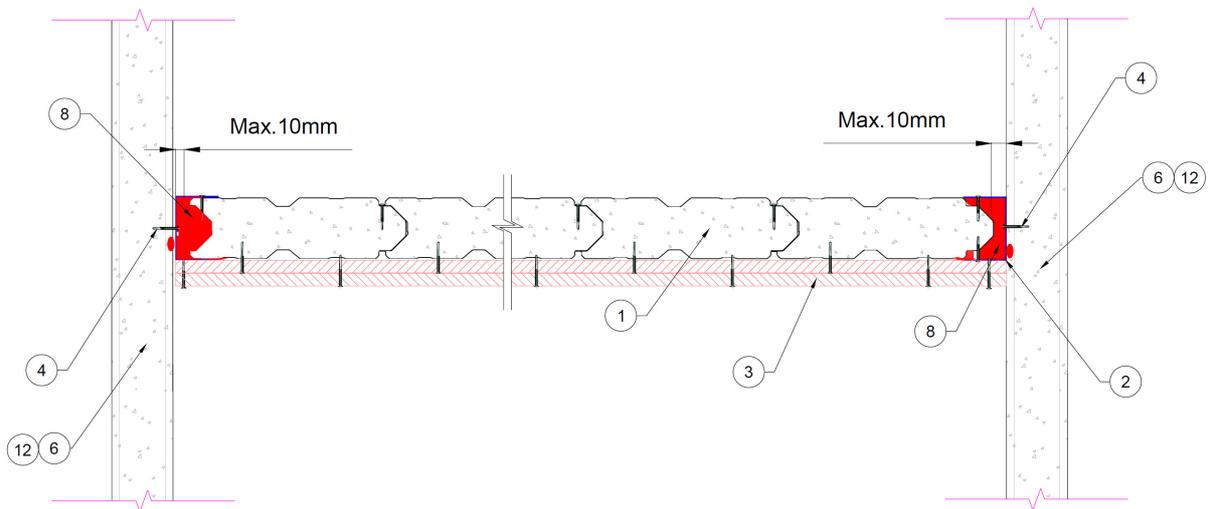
Speedpanel ceiling protected with plasterboard linings (Cross Section View)
